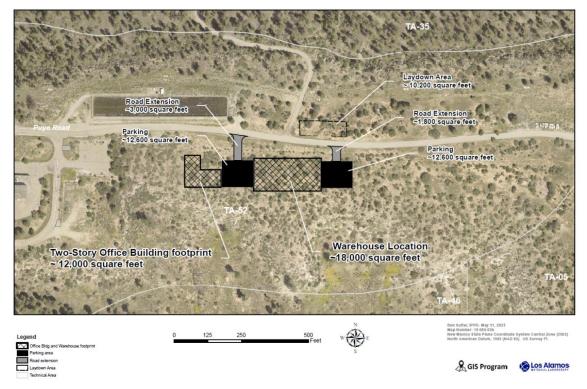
Potential Facility and Laydown Area Location at TA-52 for the Office Building and Warehouse (LANL 2023 | Figure 1-12 |)
